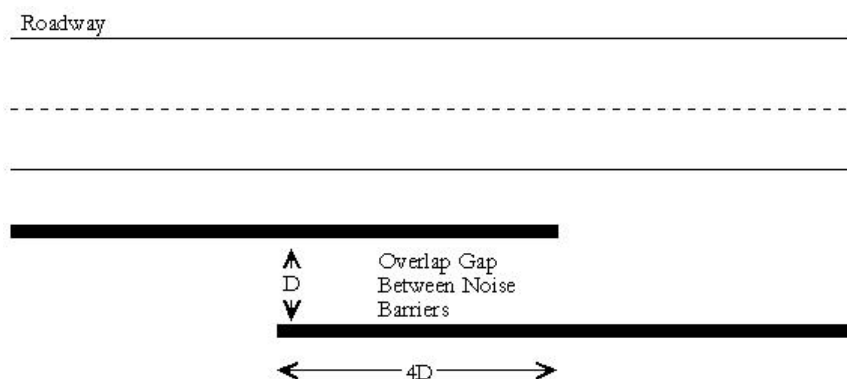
Plan view representation of overlapping barriers (*FHWA-EP-00-005*)
